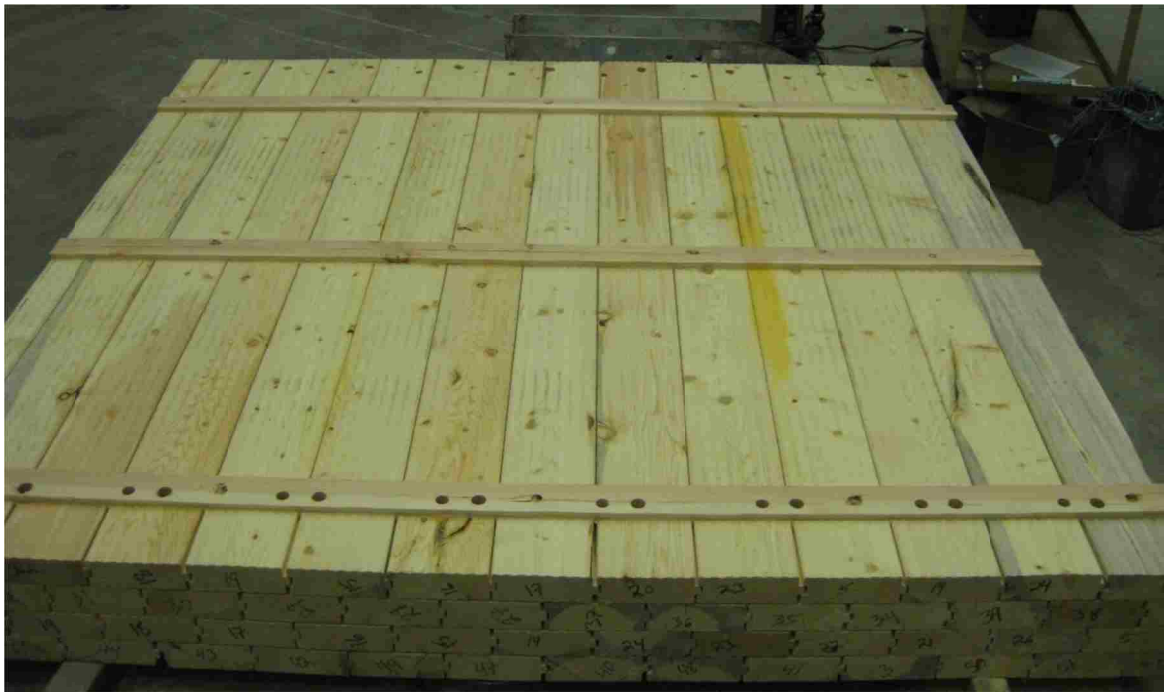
Type I VOIT Panel with One Layer Removed Showing Horizontal Dovetail Members
